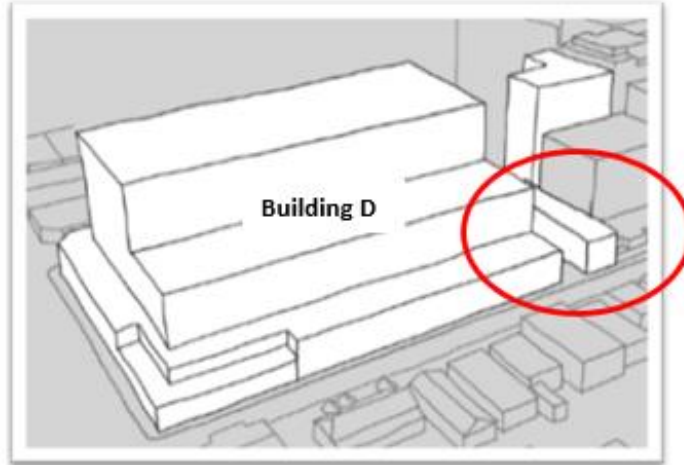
Proposed built form layout as per IFP. Source: Development Plan (Gurner 2023)
